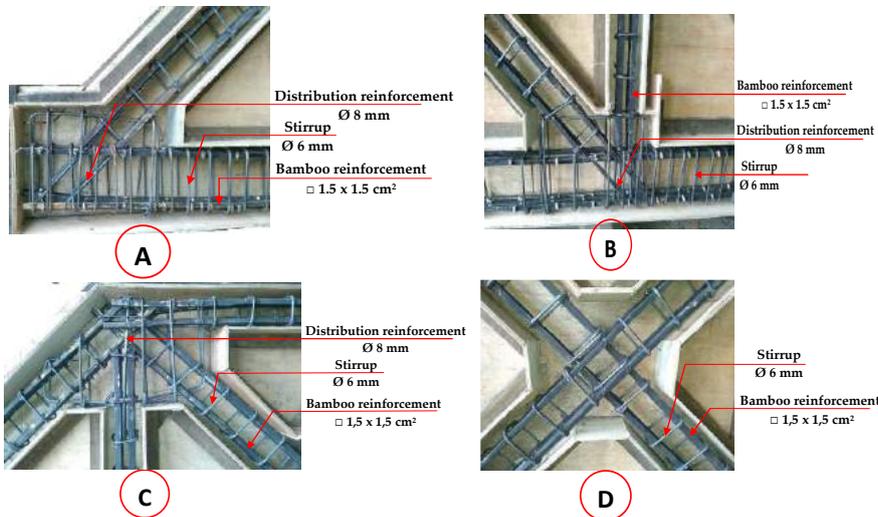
Details of the knot reinforcement for the bridge frames [23].
